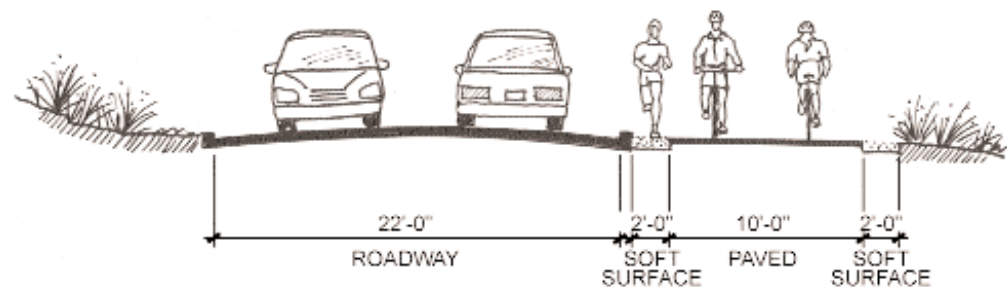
Proposed Development of Juan Bautista de Anza Trail at Battery Caulfield Road
